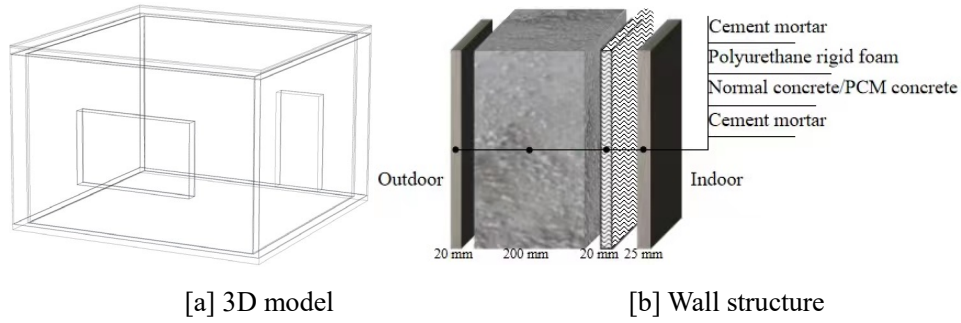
The [a][b] of the house with normal concrete/PCM concrete
